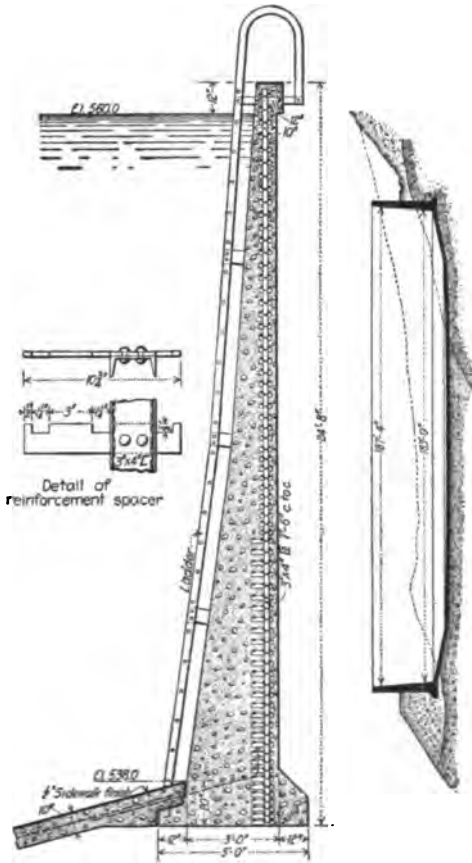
Duluth circular reservoir. Hoop reinforcement for wall was supported by notched steel plate brackets riveted to vertical channels.
